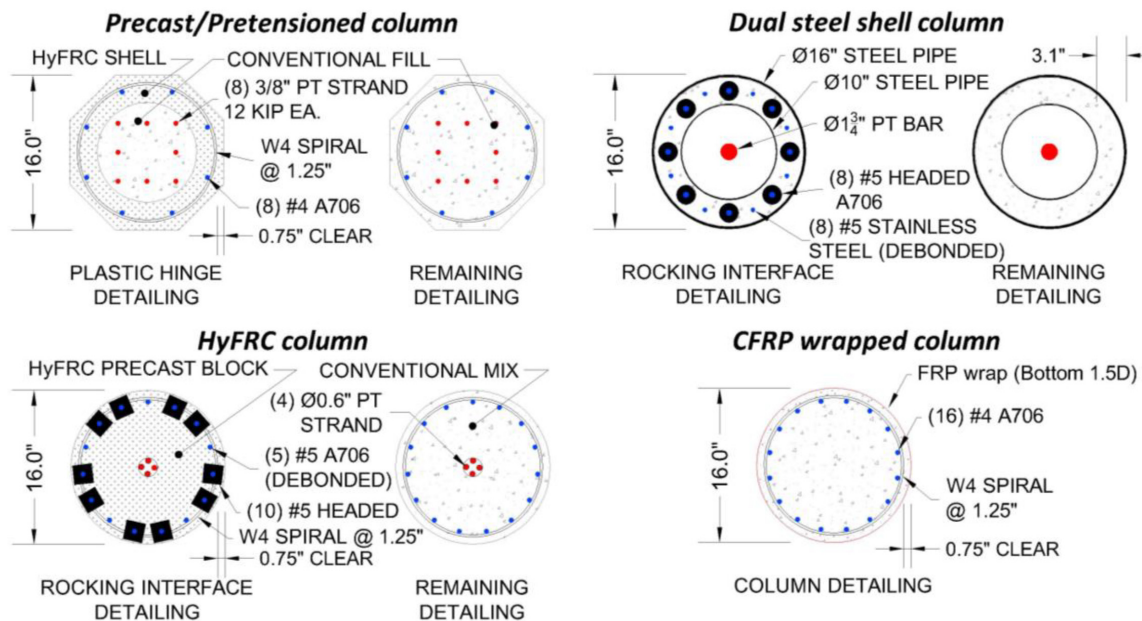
Reinforcement details of the damage resistant, re-centering columns (Schoettler et al., 2013).
